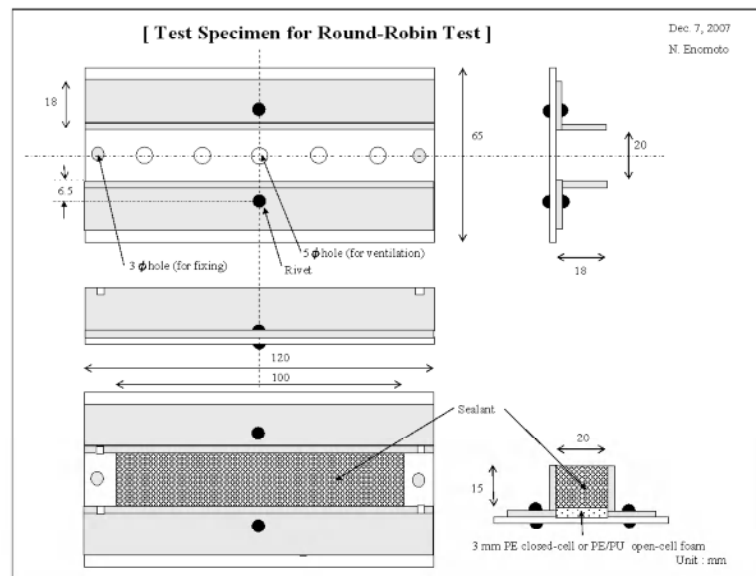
Schematic drawing of test specimen: sealant in anodised aluminium support used for cyclic mechanical movement of sealant
